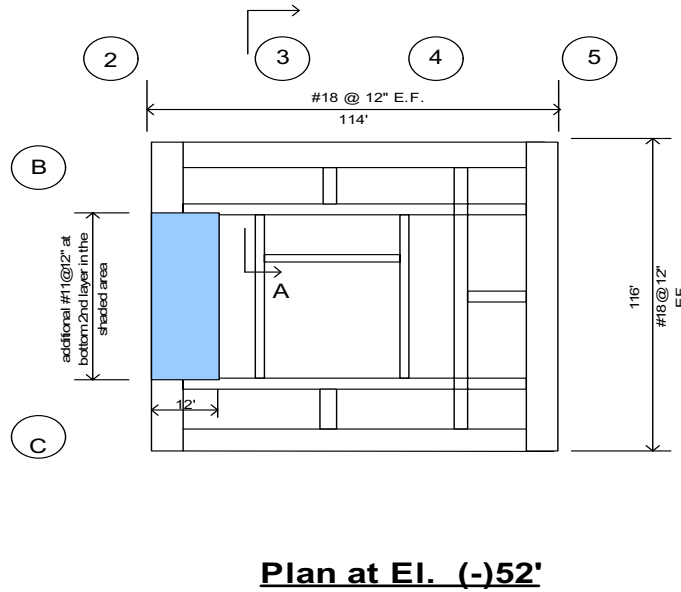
Pool Basemat Reinforcement (8' thick concrete)
